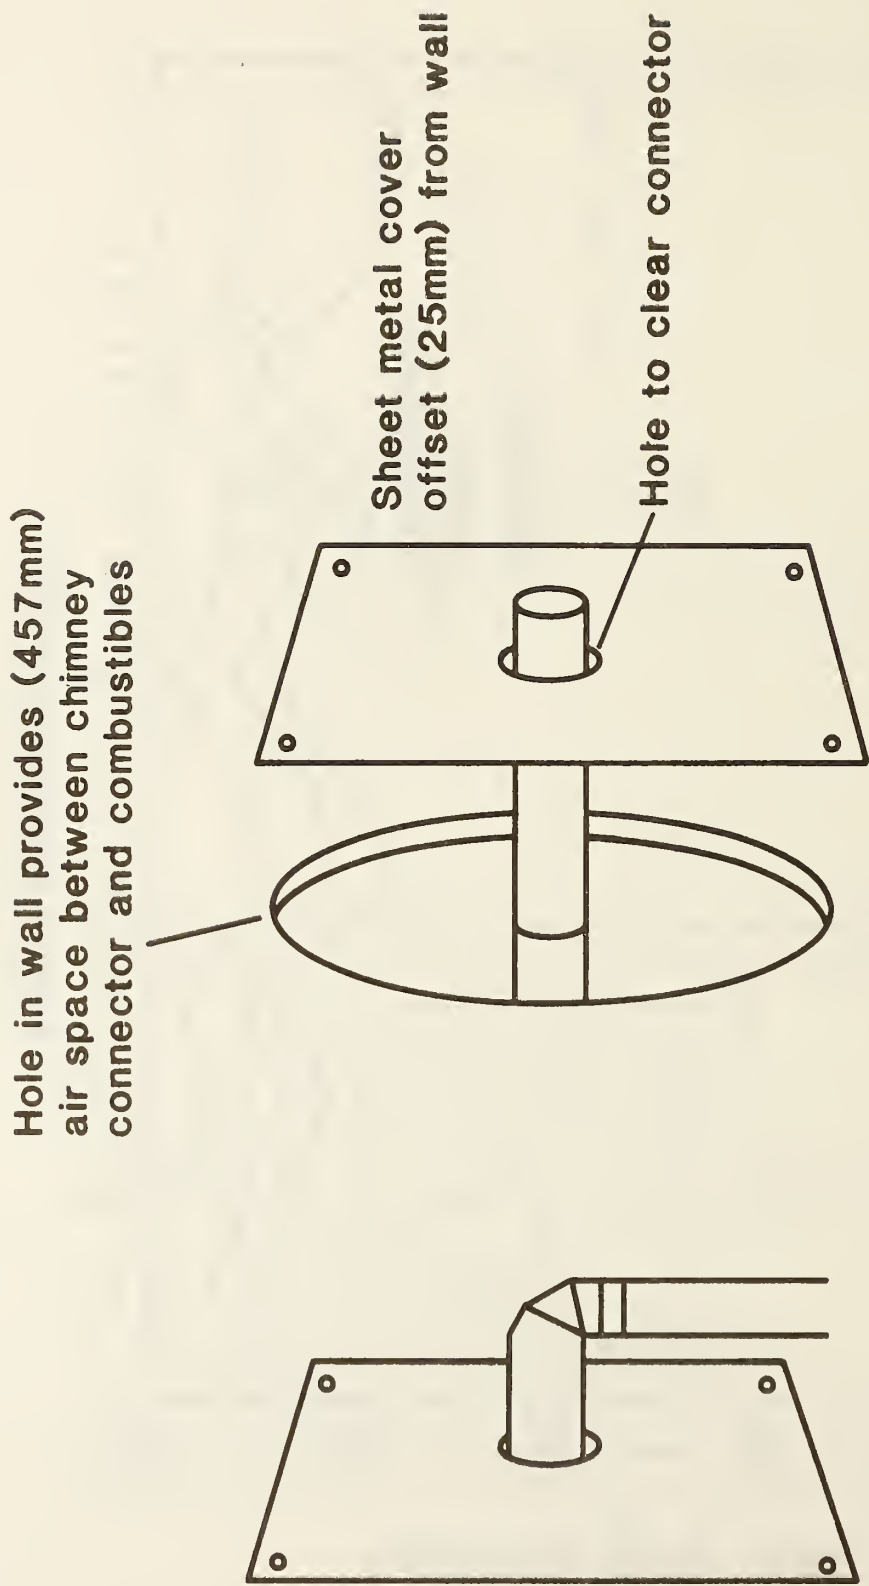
Chimney Connector Through a Wall Combustibles (457 mm) from Connector
